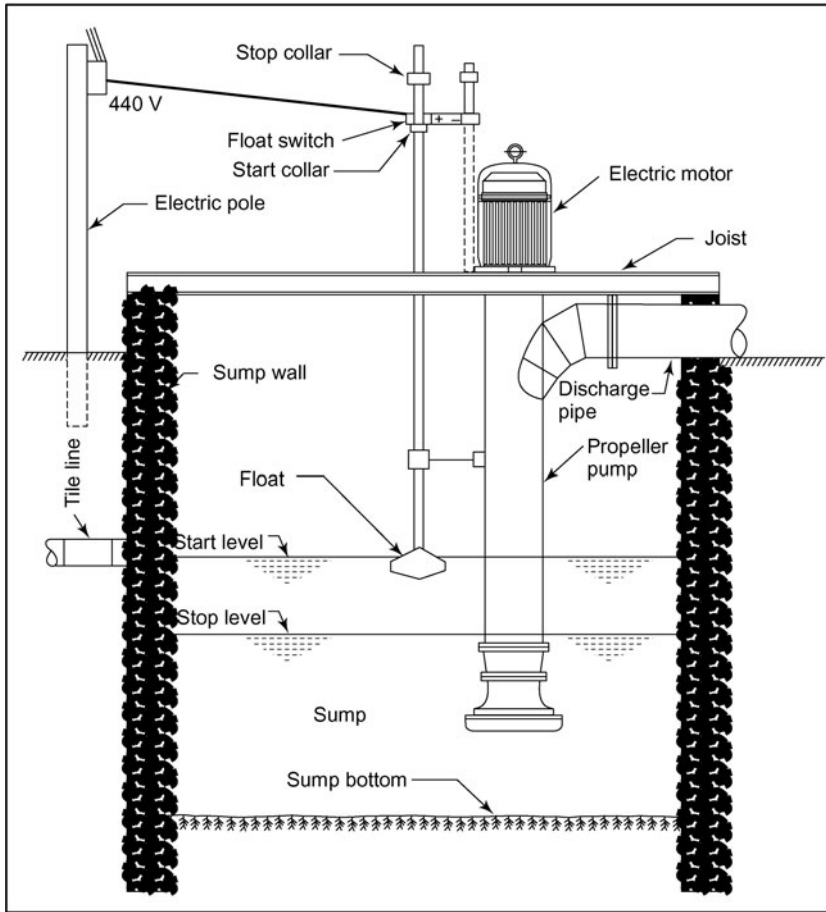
Propeller pump with automatic switch installed in a drainage sump
